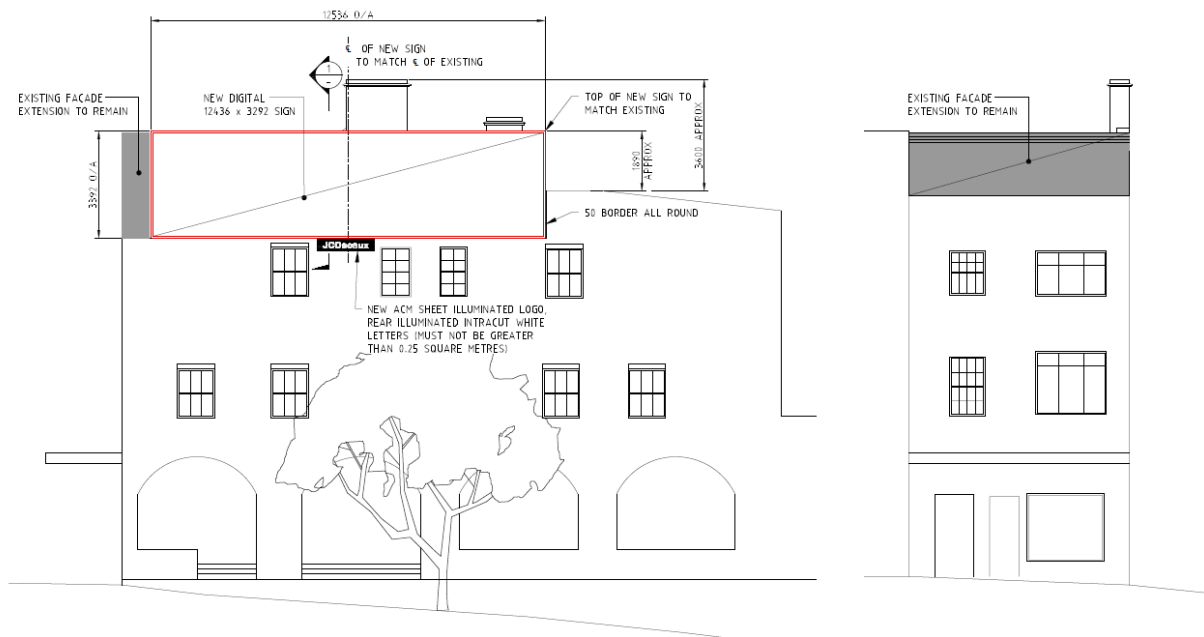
Proposed William Street (left) and Victoria Road (right) elevations
